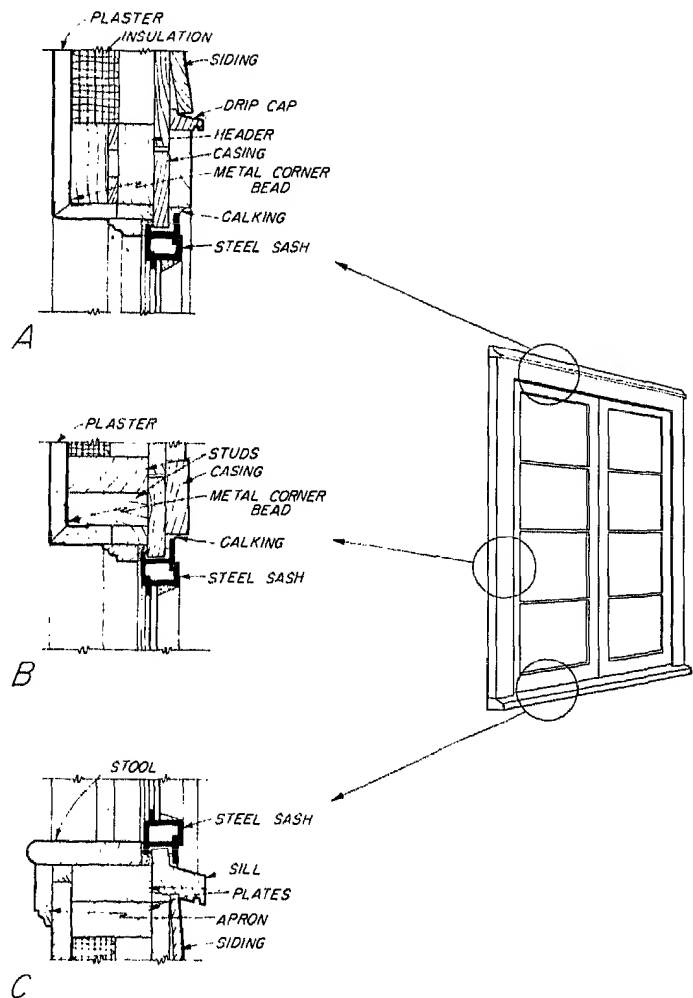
Solid-section steel outswinging casement sash. Cross sections: A, head jamb; B, side jamb; C, sill.
